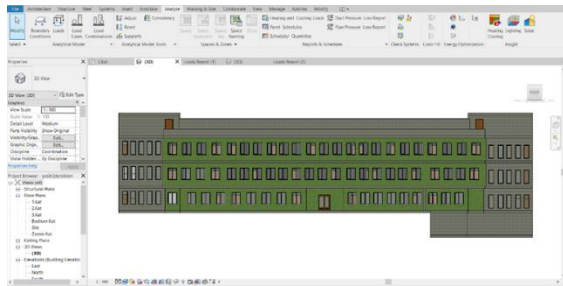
R2 Classrooms building west facade view with vertical green system applied
